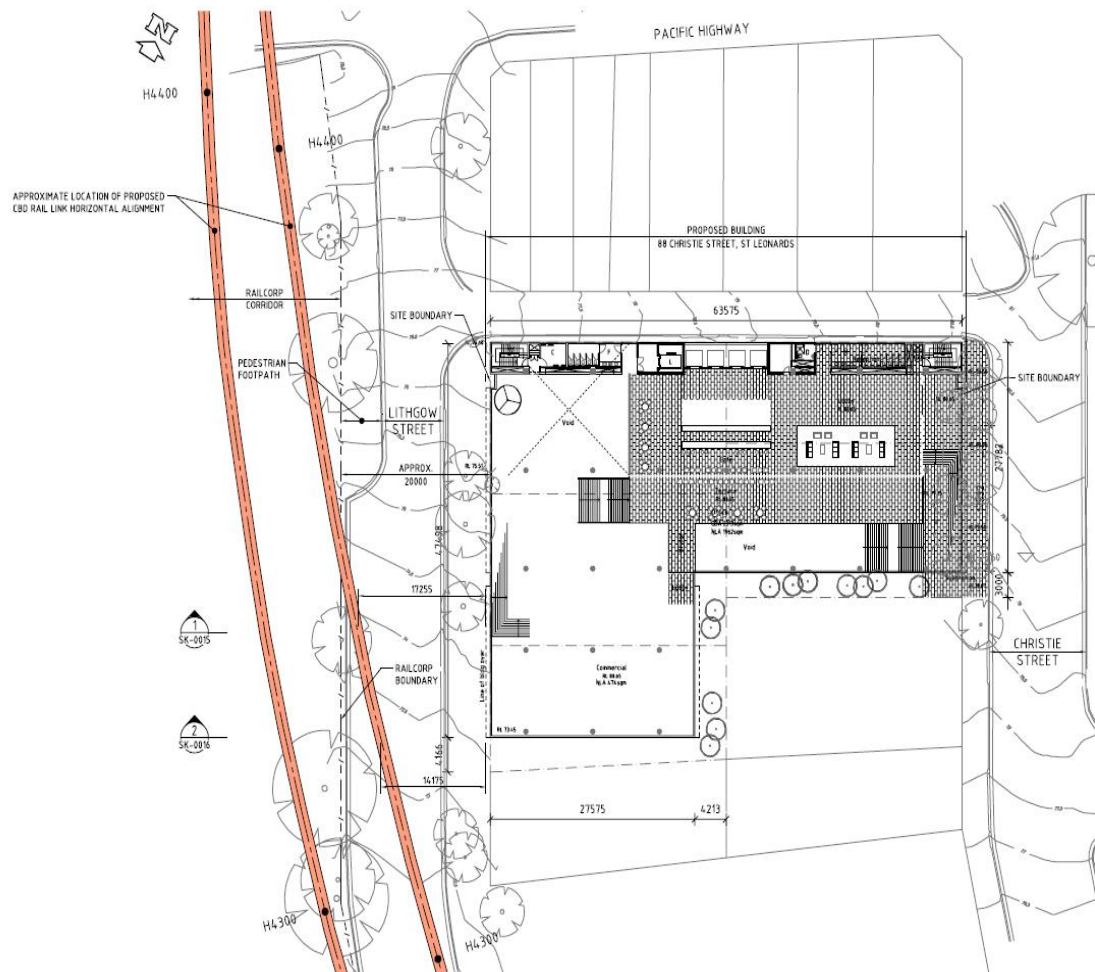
Site of 88, Christie Street proposed commercial development with proposed CBDRL alignment.
